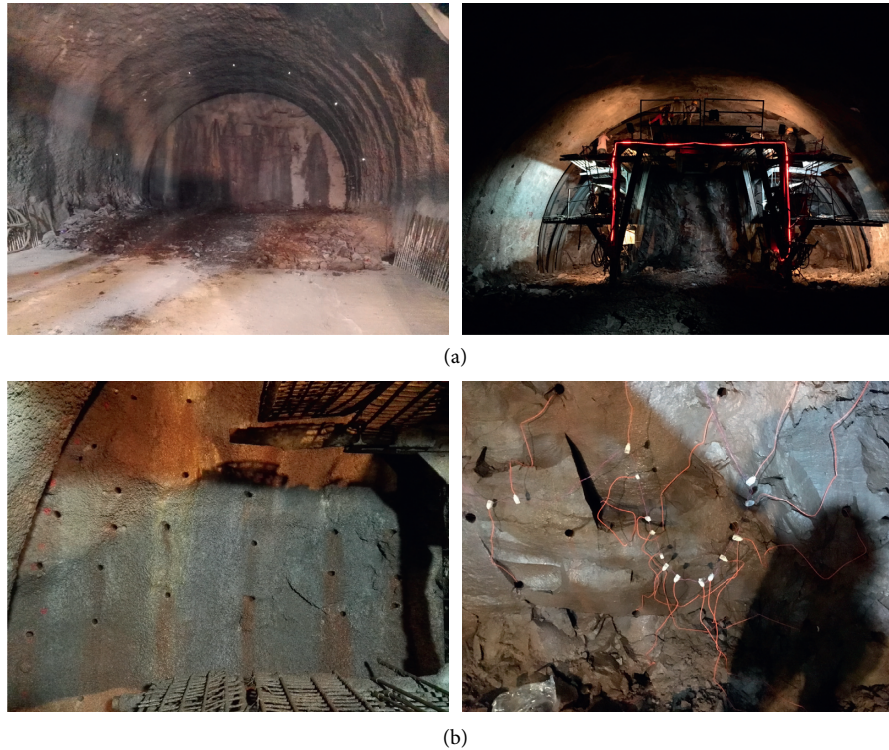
Tunnel excavation. (a) Tunnel face. (b) Blasting layout site.
